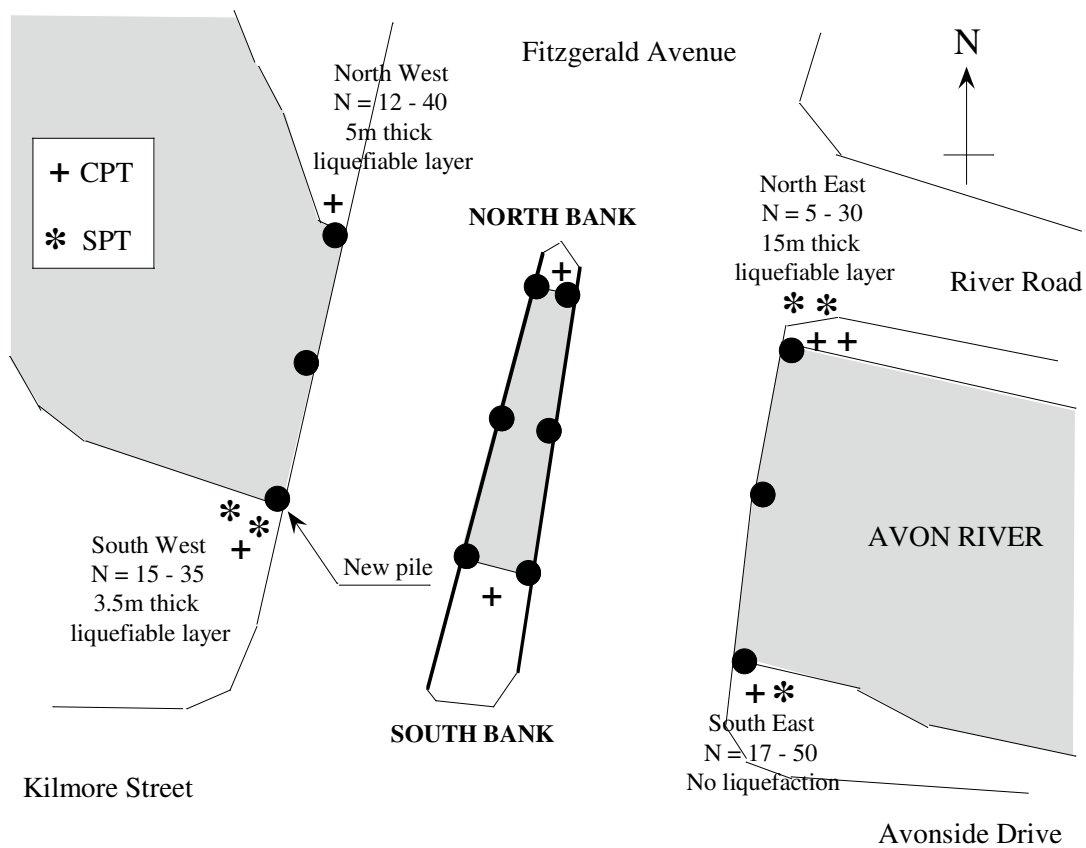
Plan view of the bridge site, showing site investigation locations
